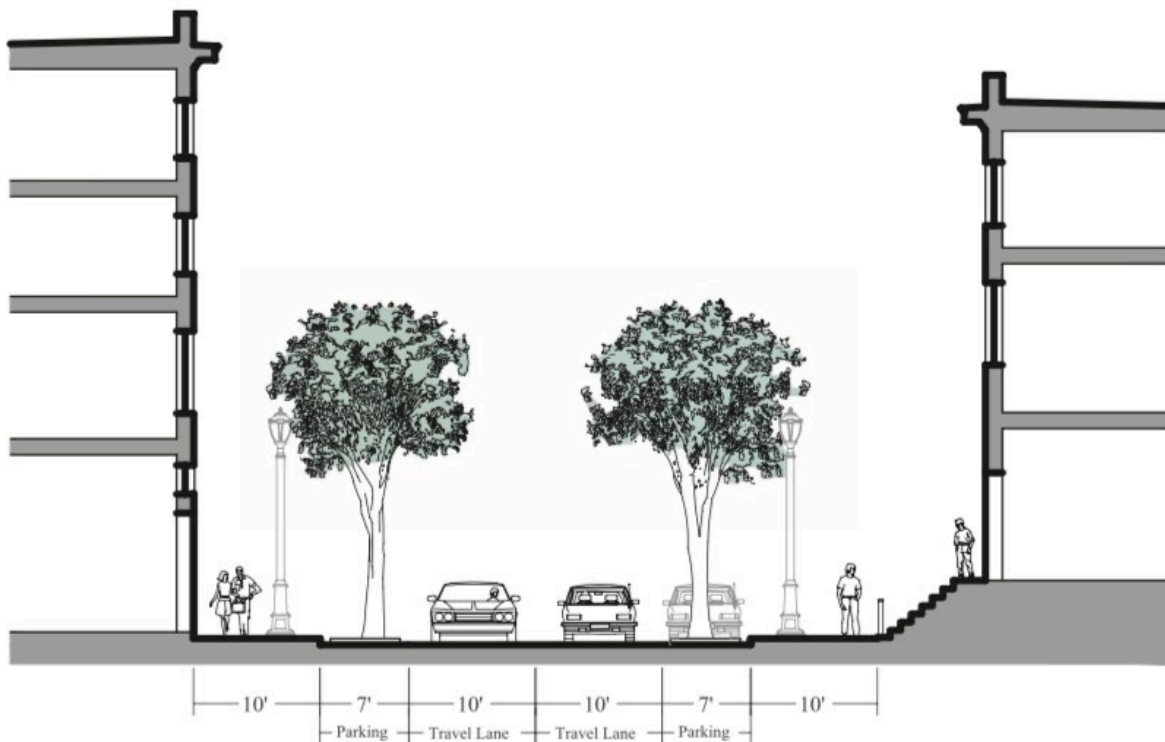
Section of Bartram Street, Glenwood Park. Image courtesy of Dover, Kohl & Partners and Tunnell-Spangler-Walsh.
